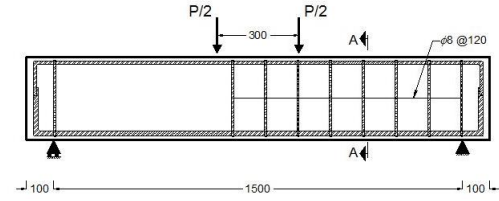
The geometric dimensions and reinforcement details of the test specimens (all dimensions are in mm)
